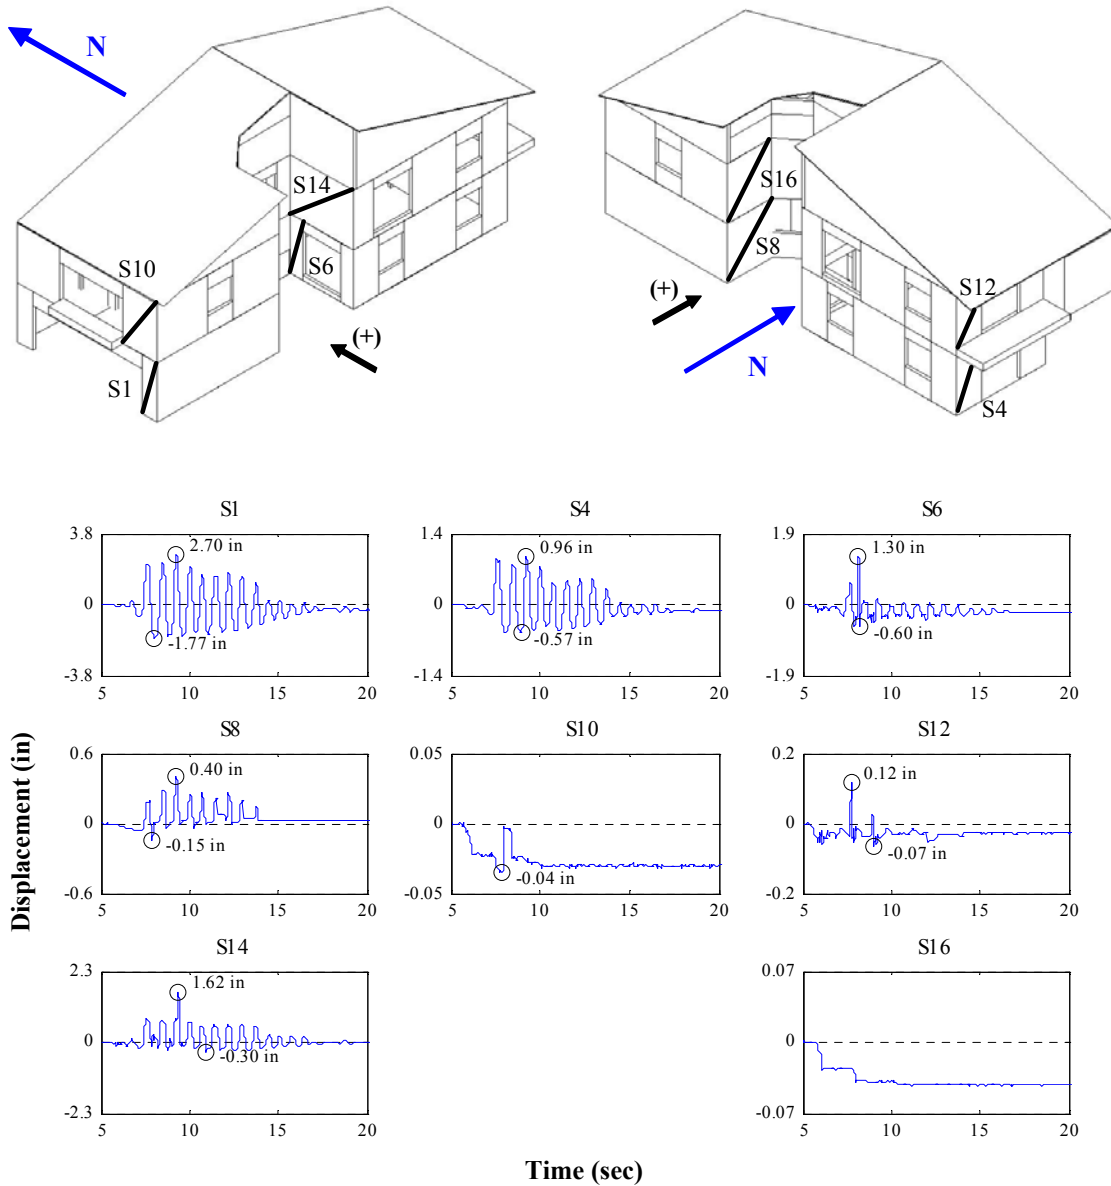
Wall deformations of north-south external walls for Test NWP5S11
